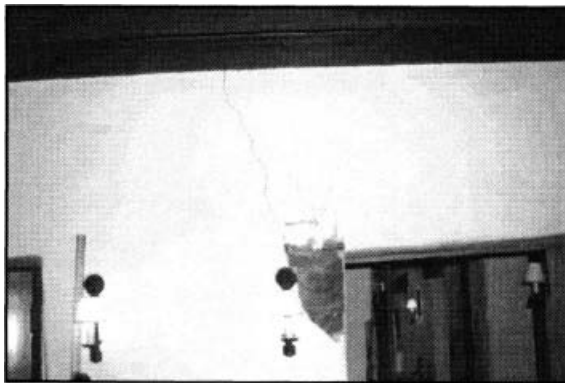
Rocha Adobe. Minor cracking in one of the interior walls.
